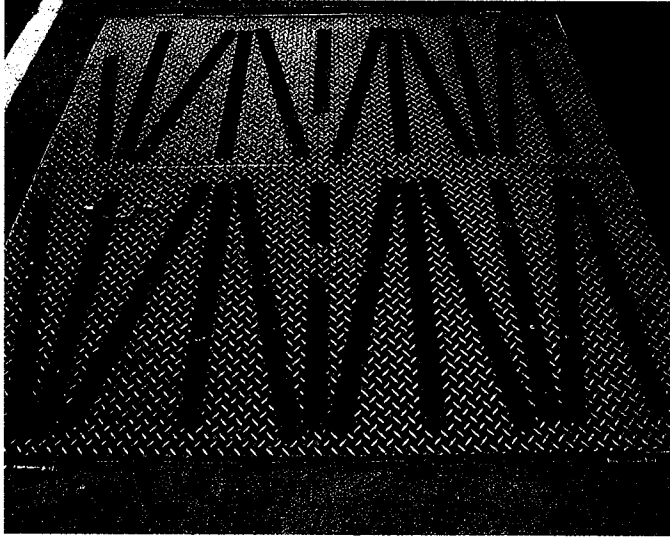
Example of Tread Tape on Sub-Sidewalk Elevator Doors
